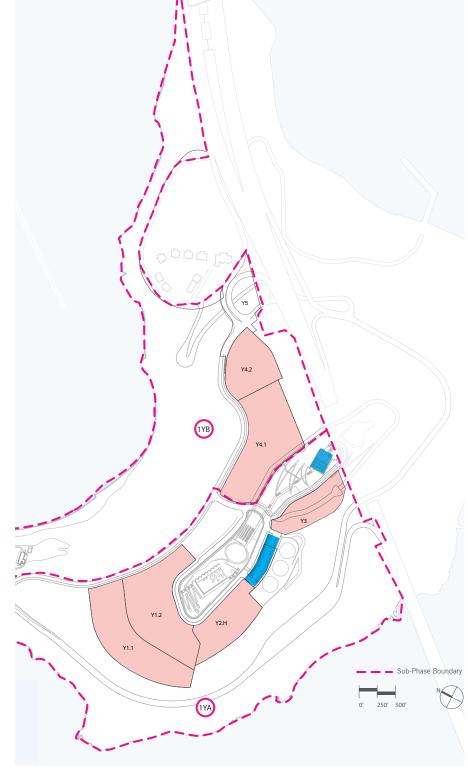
SUB-PHASE ANTICIPATED OFF-STREET PARKING LOCATIONS
